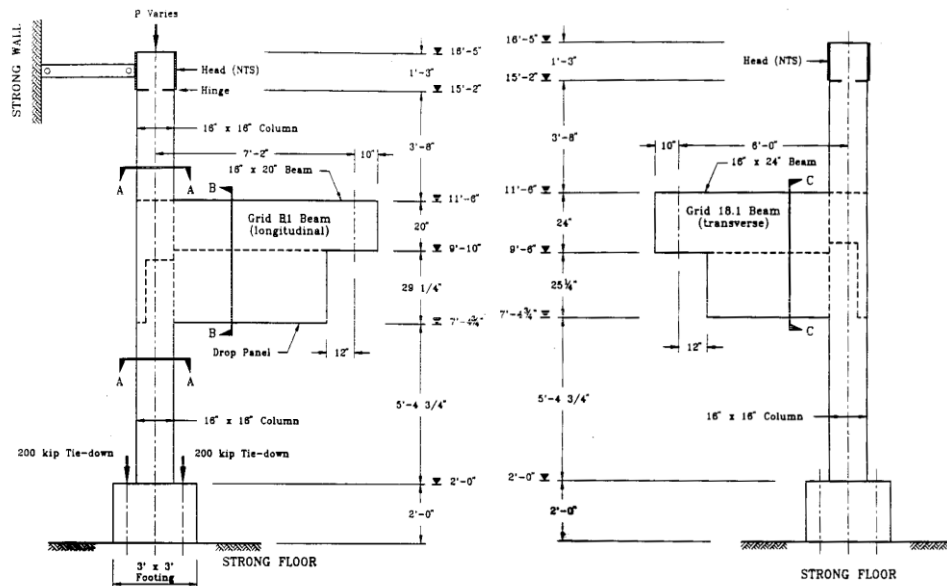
“As Built” specimen details in longitudinal and transverse directions, Priestley and Hart [129]
